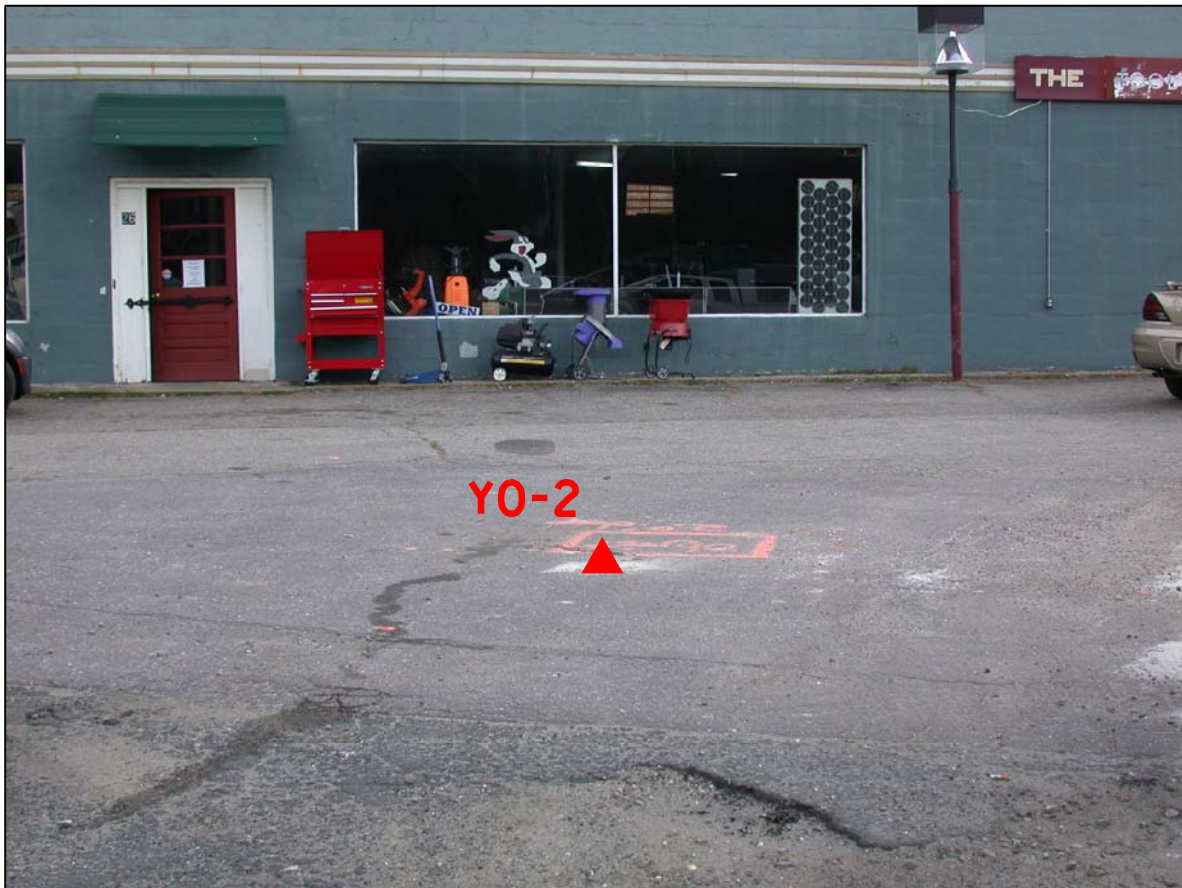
BORING ON WEST SIDE OF BUILDING AT ANOMALY LOOKING EAST
